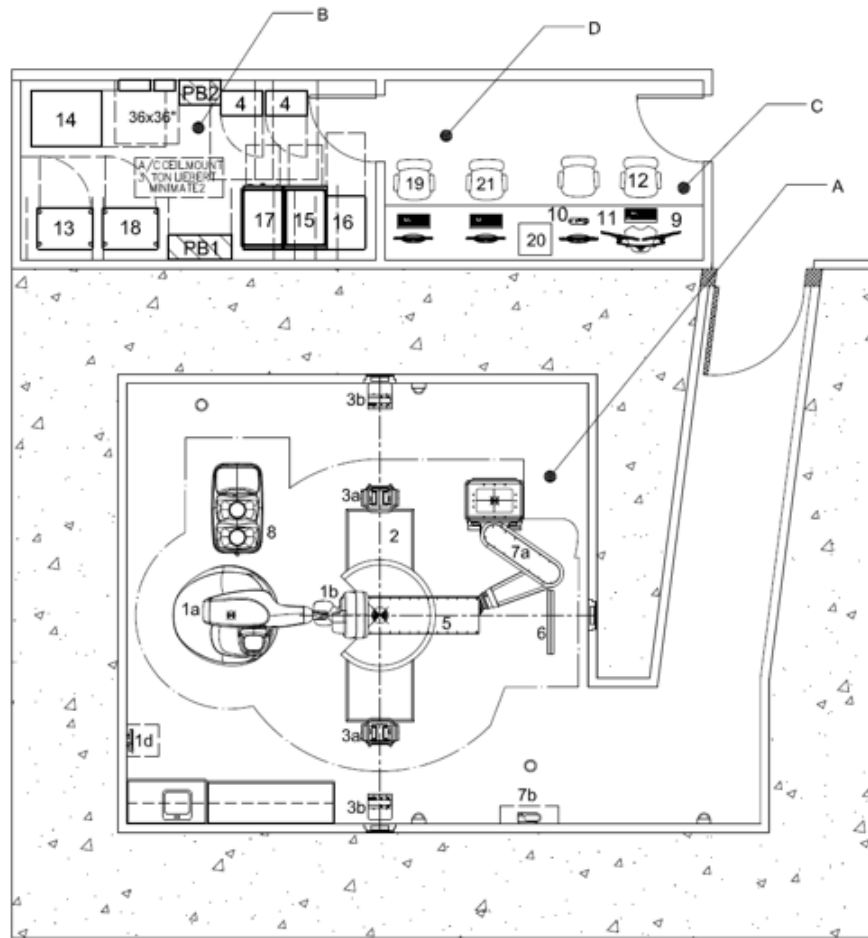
Typical CyberKnife® Floor Plan with Maze Walkway
